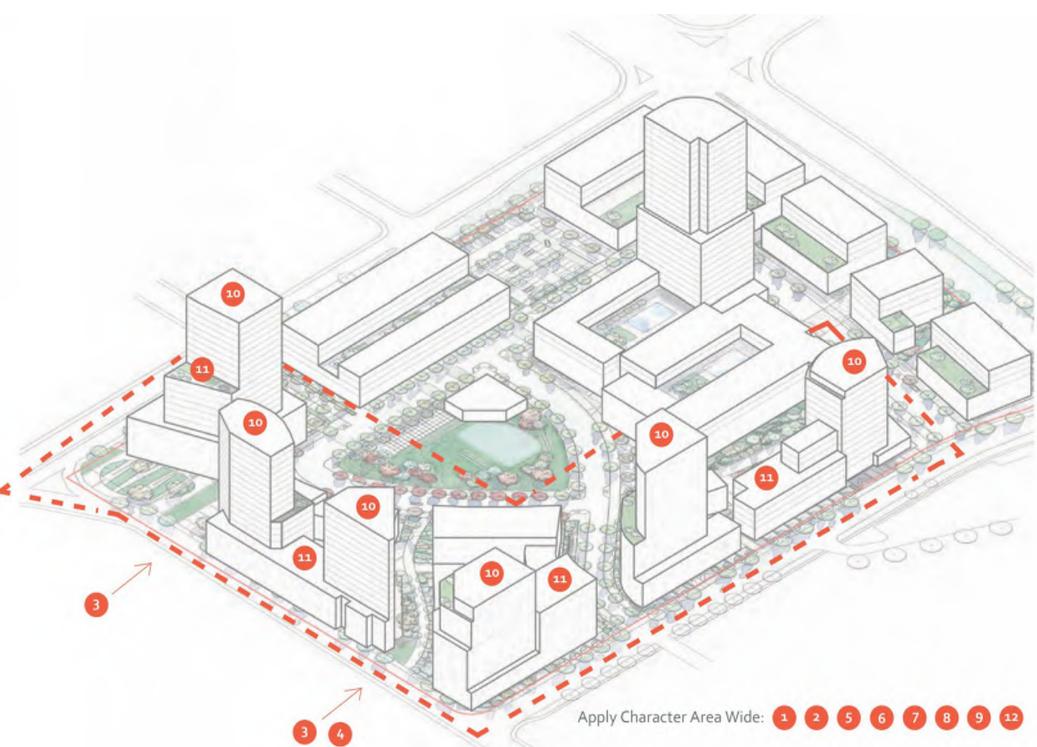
Capri Centre Concept Plan - Comprehensive Zone 26 - OCP 2040
